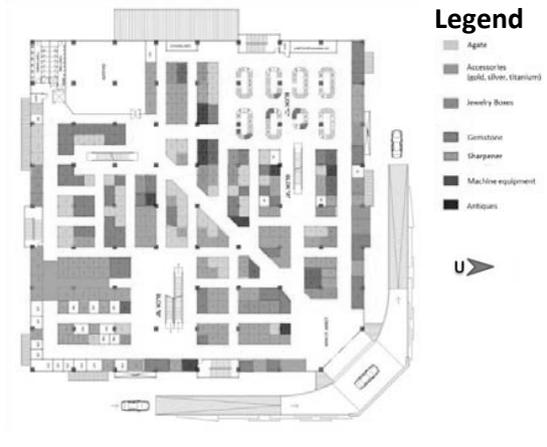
Plan of 2nd floor of Gemstone Market in Rawabening
